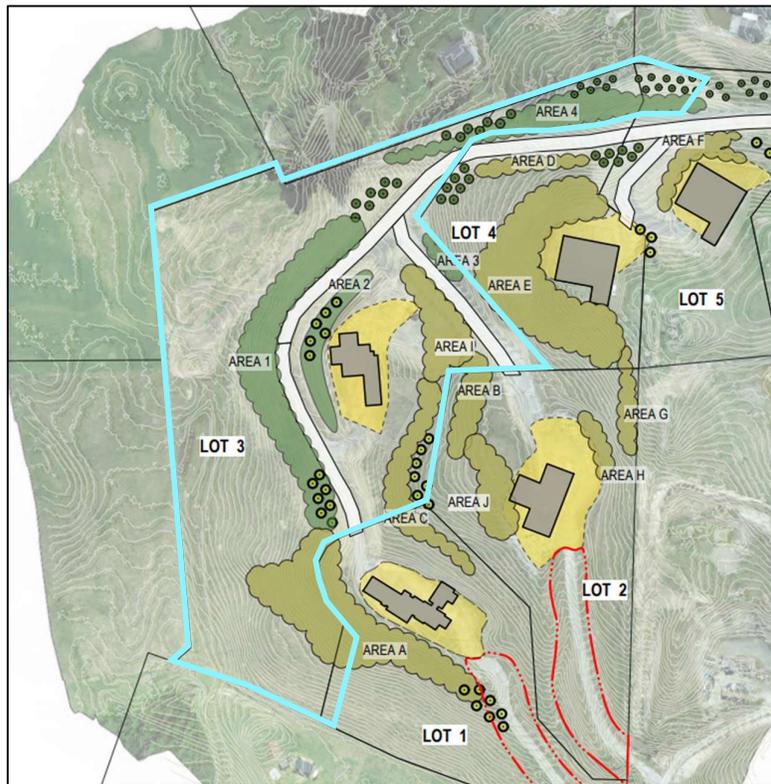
Snip of structural landscape plan. 77 Frogmore Lane is outlined in blue and contains a building platform. A house is currently under construction within the platform, in accordance with RM250133.
